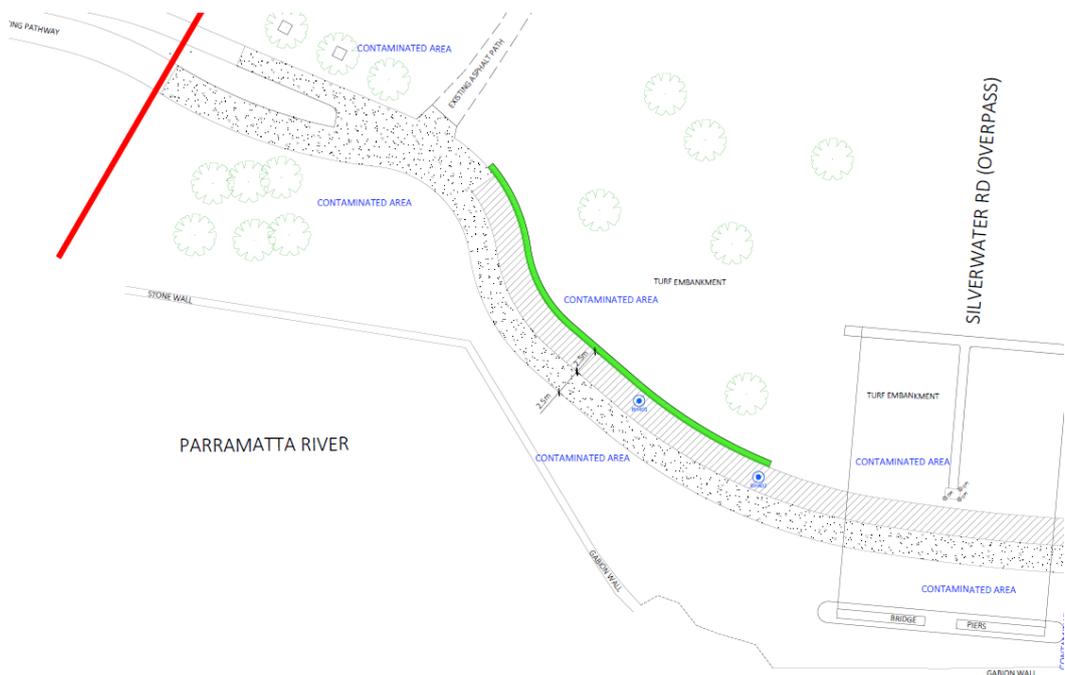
Proposed Hardworks, Boardwalks and Bridges Plan 1. Source: City of Parramatta
